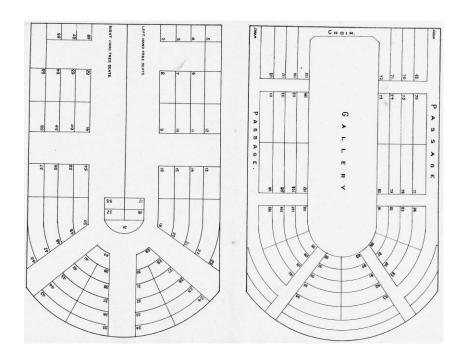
Original Pews Seating Plan -Ground Floor (left) & Gallery (right)
